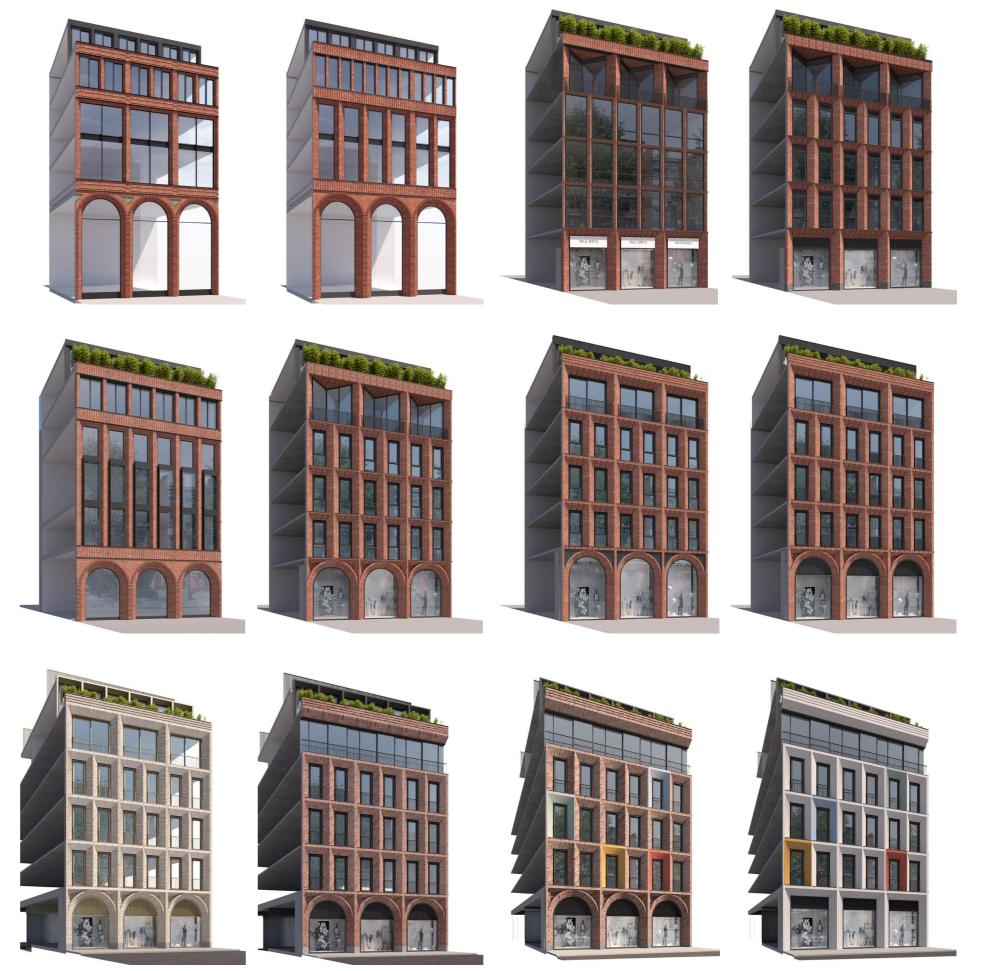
Illustrative visualisations of early facade proposals to Kensington Church Street building
